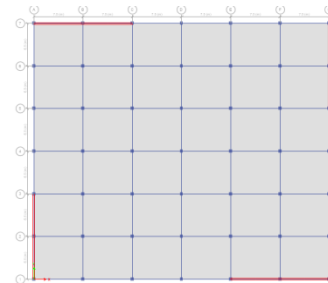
Plan shown with SWP-1[Shear wall position-01] . It's a building plan with shear wall at alternative corners.
